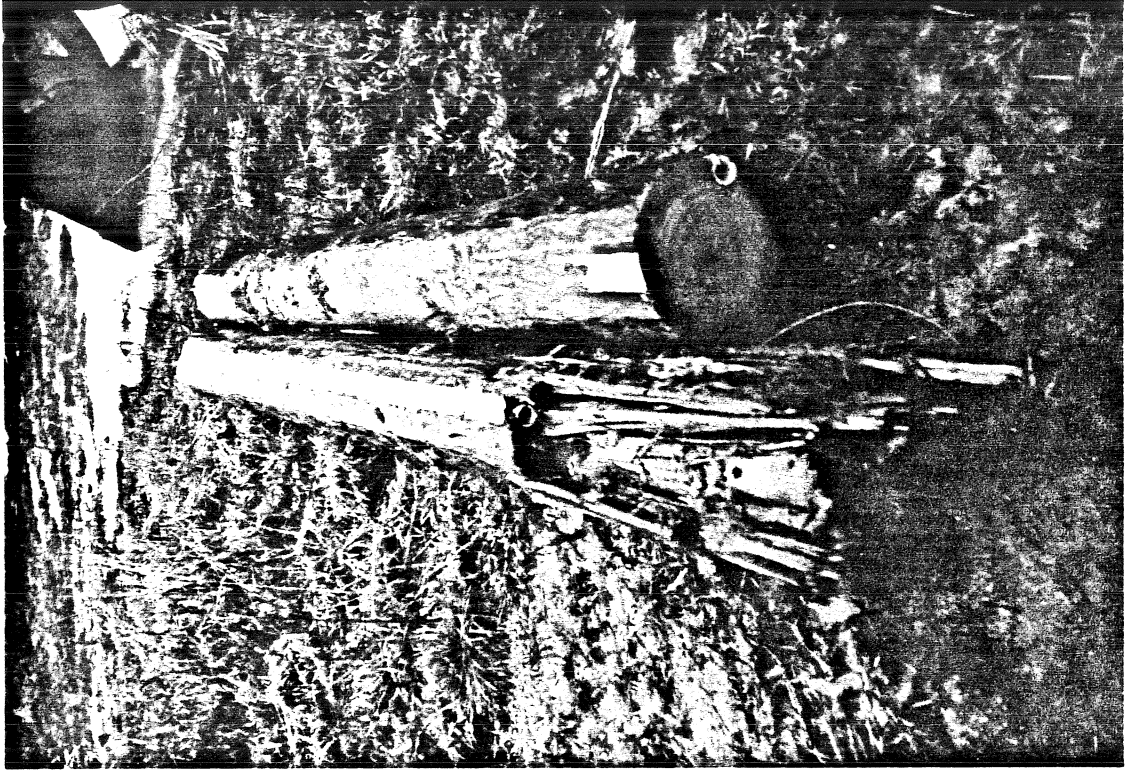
'BROKEN' SECTION OF FIELD TESTED PILE
